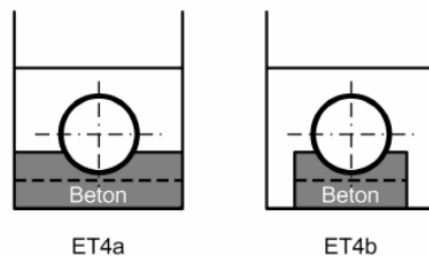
Embedding type with support on concrete (Germ. “Beton”) [7].
